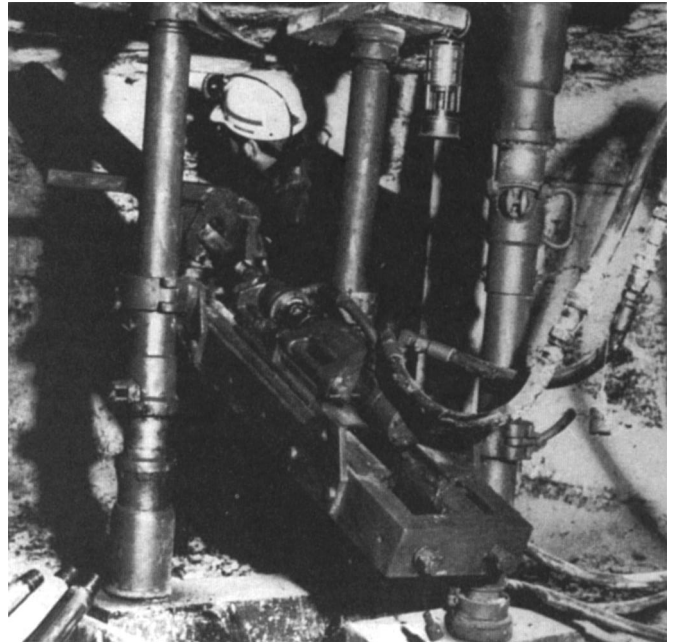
Drill unit for cross-measure boreholes.
